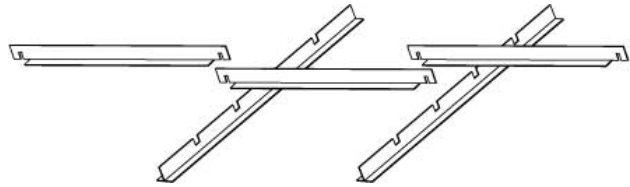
Another Optigrun system for slope stabilization entails anti-slip tees that interlock. They transfer the load of the green roof to a structural parapet or fascia. (Conservation Technology, Inc.)
